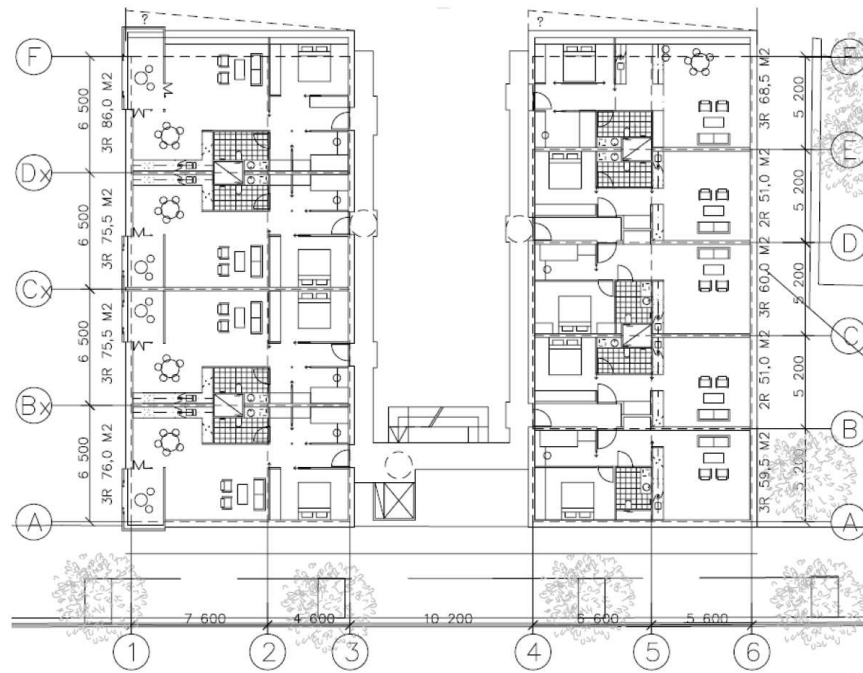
Sketch of the 2nd floor of the apartment building [Hjerkinn, 2007].
